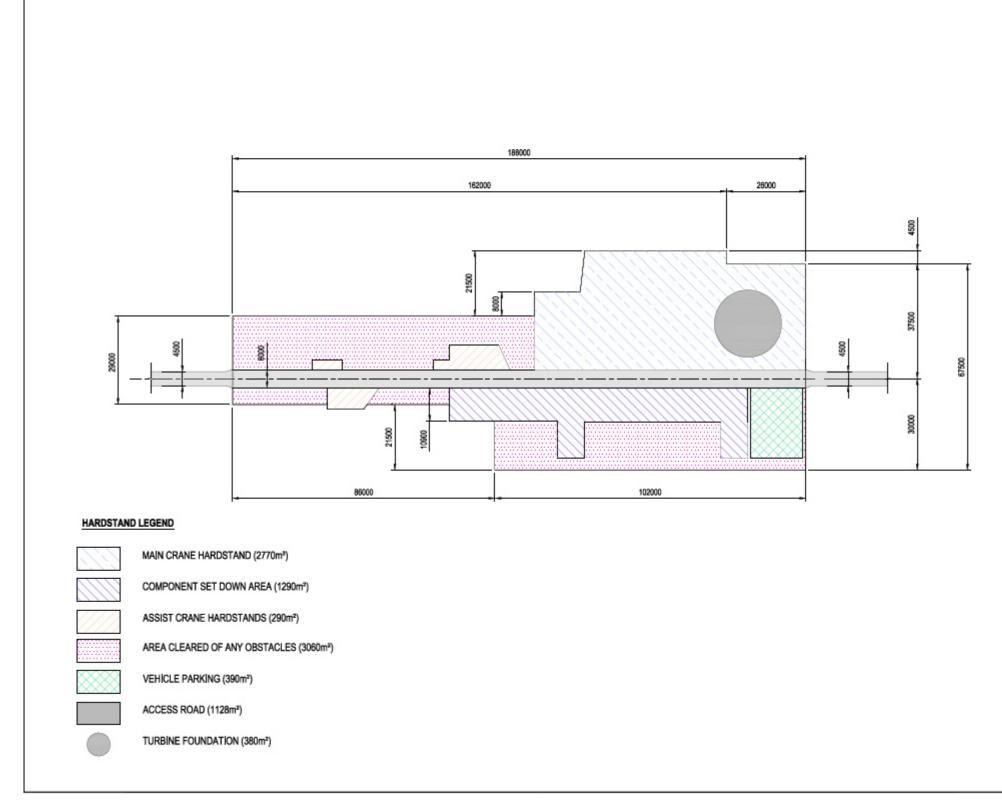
Crane Pad Hardstand Design (Excerpt from Drawing No. 6129-PL-601)
